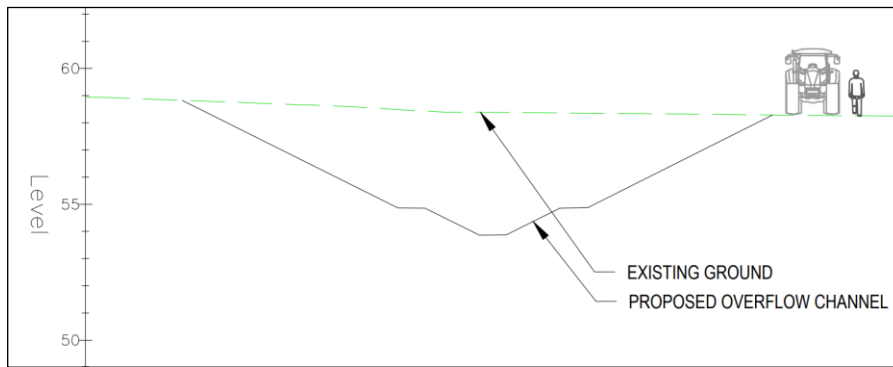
Concept Cross Section in deep cut section showing existing and proposed levels
